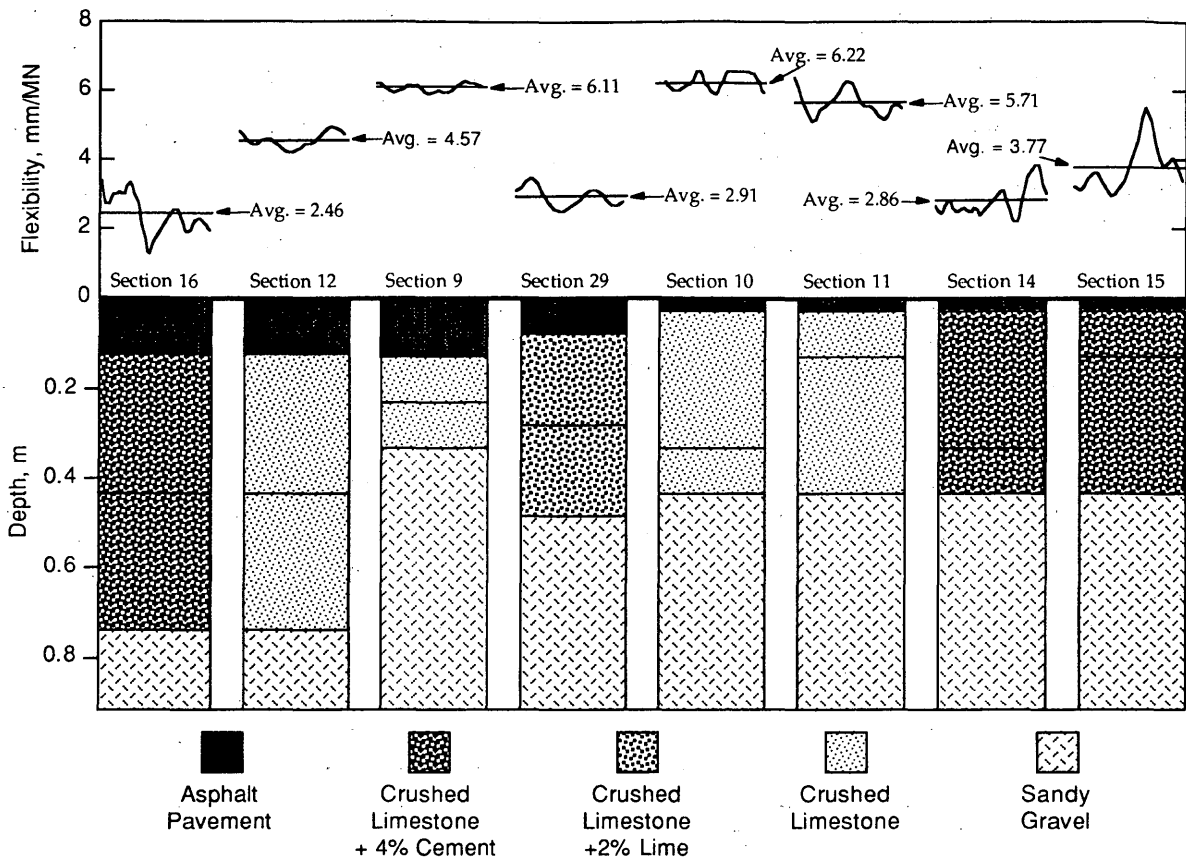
Flexibility and pavement profiles of eight flexible pavement sections at TTI test facility determined with RDD operating at 22 Hz and 67 kN (15,000 lb).
